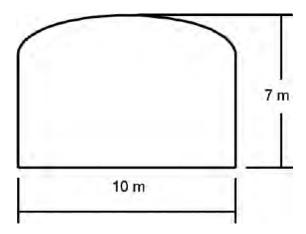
Cross-section of a main tunnel (according to /SKB 2002/).
